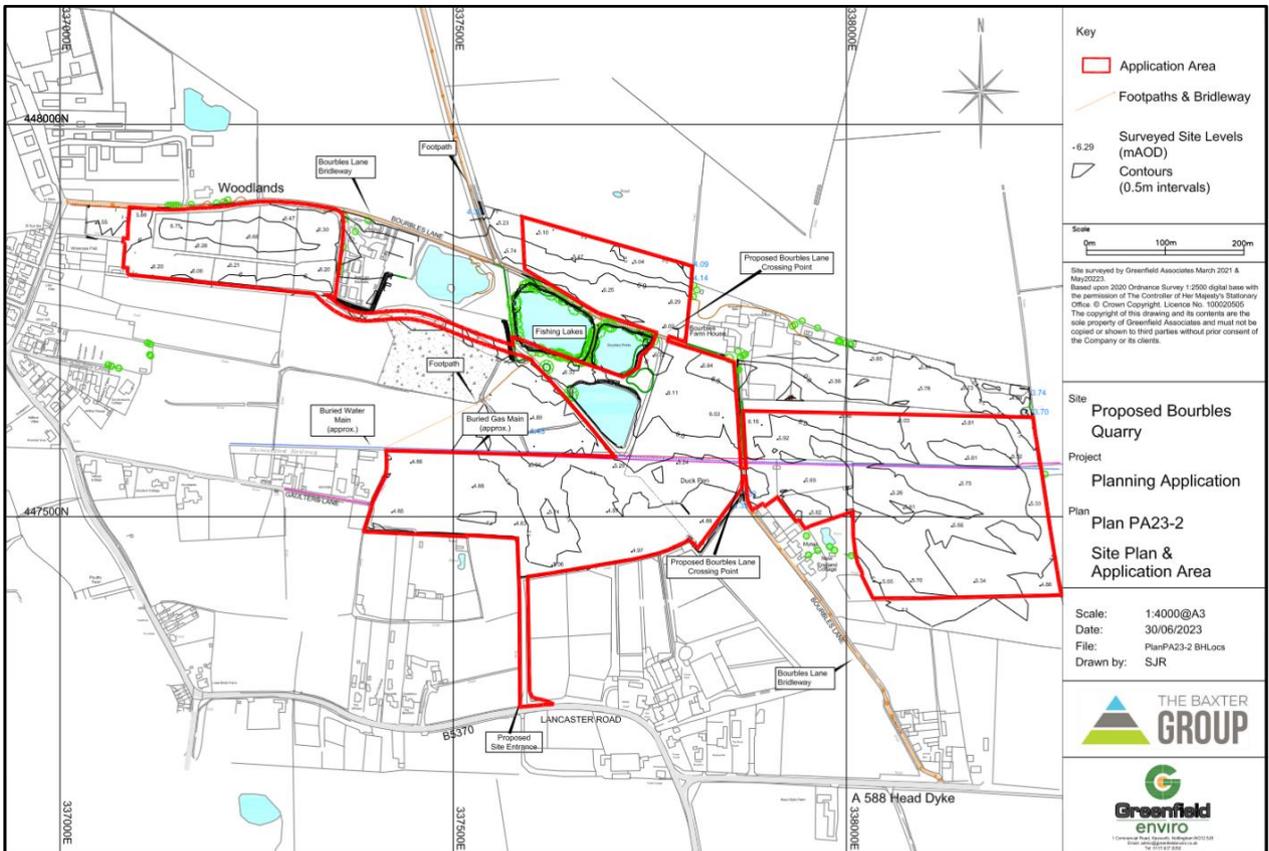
Proposed Bourbles Lane Quarry Site Plan
